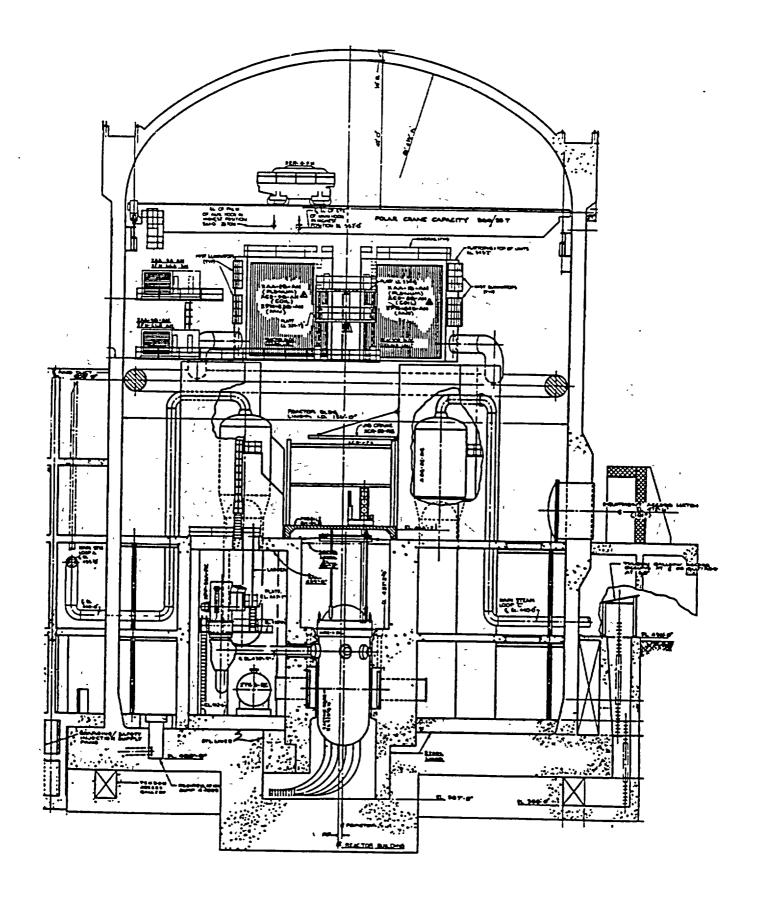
Section Views of the Summer Large, Dry Containment (3-D Post-Tensioned Concrete) (Sheet 1 of 2)
